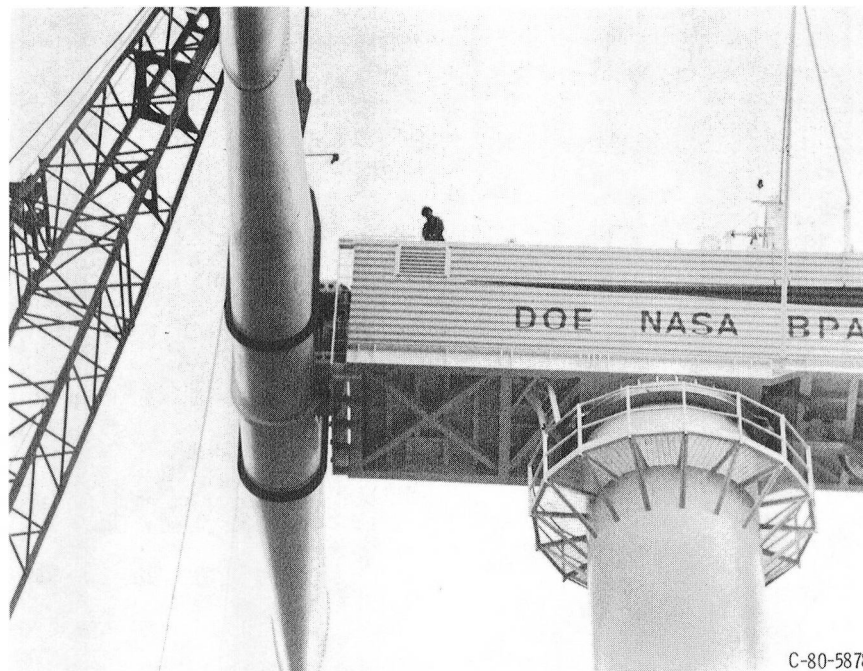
Mod-2 rotor hub and nacelle during assembly.
